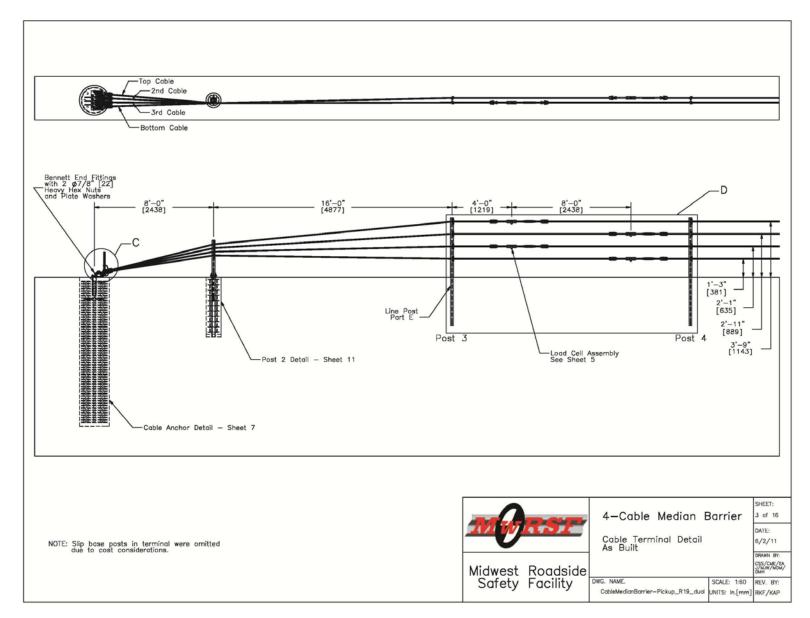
Cable Terminal Detail, Test No. 4CMB-1
